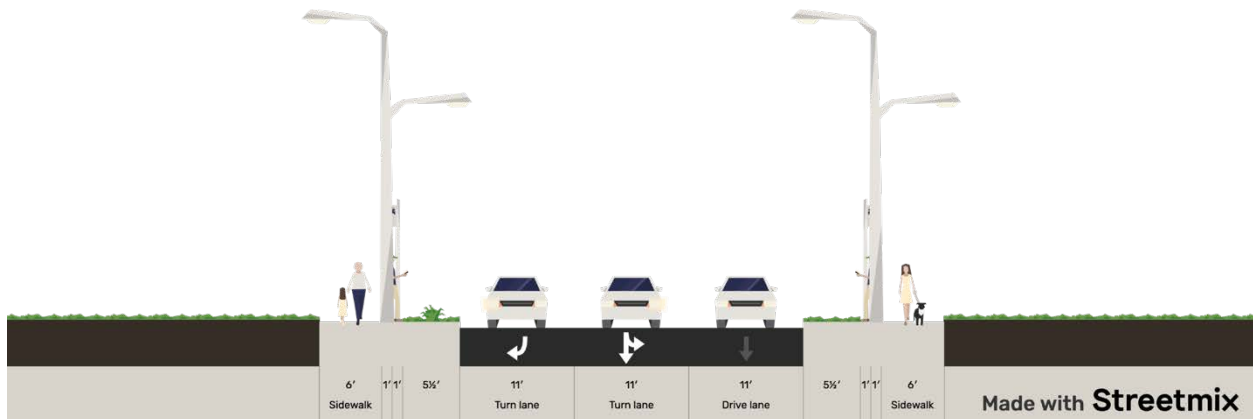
A sidewalk runs on both sides of the street. Improved lighting, street furniture, and art installations will make the sidewalk more inviting for pedestrians. Bikers can use the Tide-to-Town trail within Bowles C. Ford Park to easily get to other neighborhoods. Pedestrians should get a prioritized walk signal at the intersection to maximize visibility. Diagram created in Streetmix by EC, 2022.
